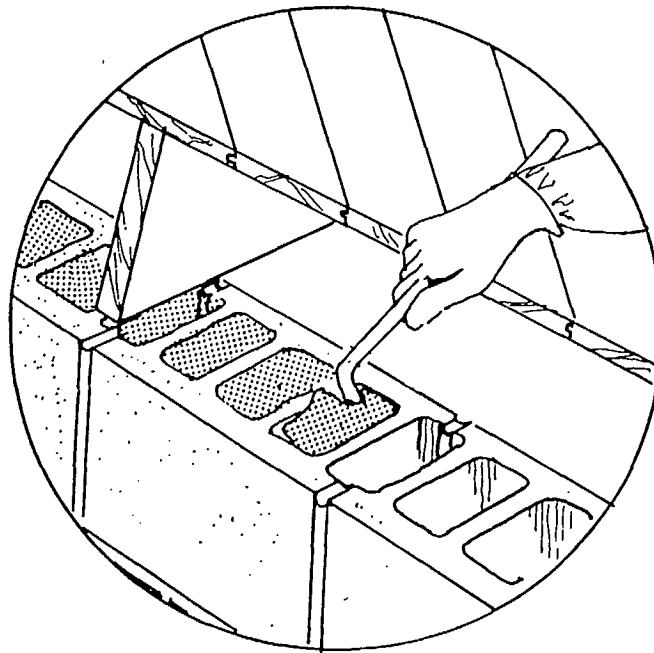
(B) UEFI REMOVAL FROM HOLLOW FOUNDATION BLOCKS
